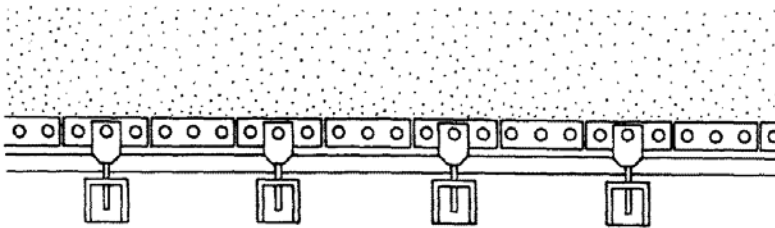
Typical rigid membrane edge with fitting and tension elements according to [Bub97]
